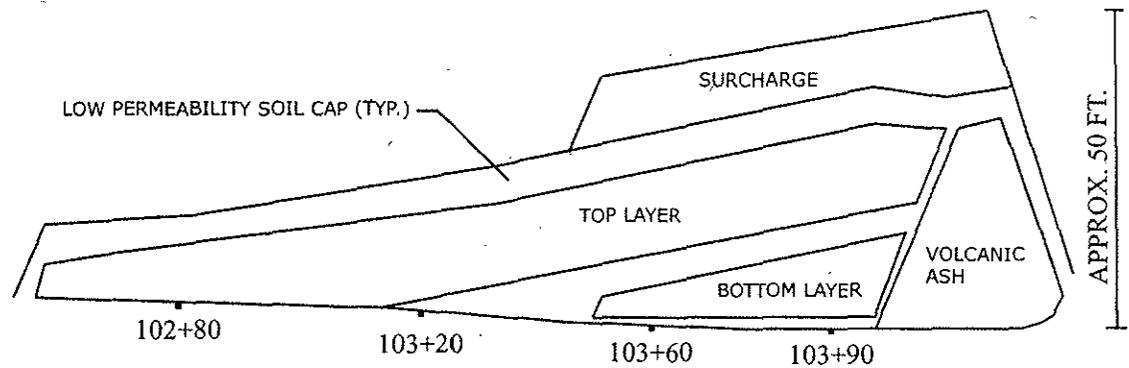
Longitudinal section, Dixon Landing Interchange.
